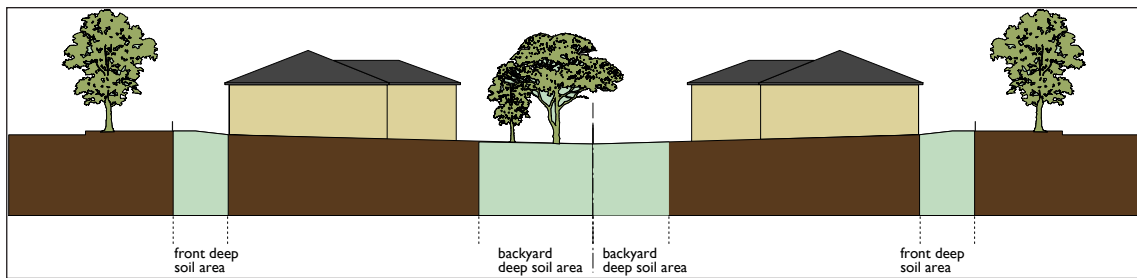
Deep soil areas are free of structures. They fit neatly around the building without obstruction of either above or below ground built elements such as outbuildings, driveways, impervious surfaces, basement garages, detention tanks or paved terraces.
